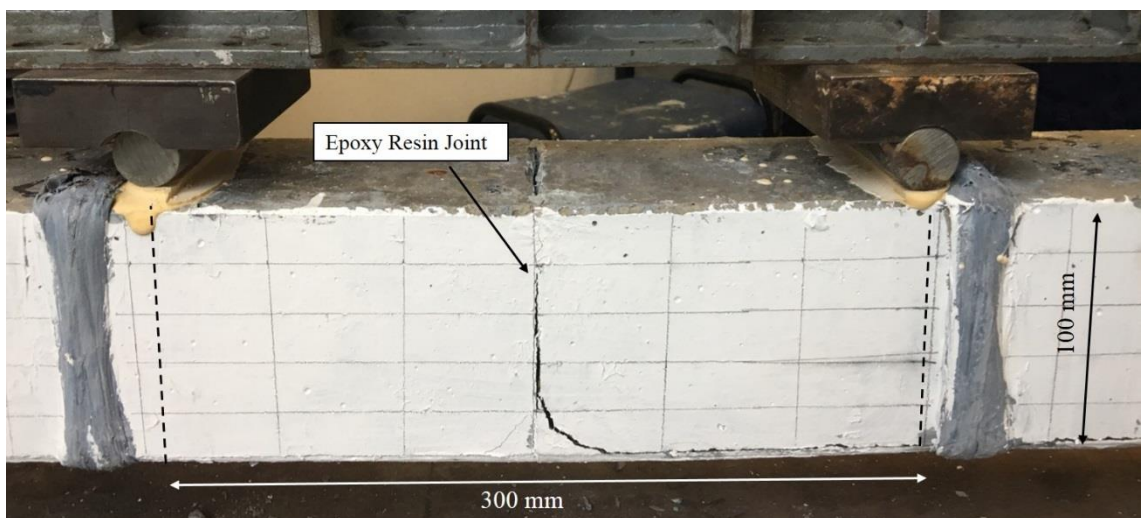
Crack and failure of the under-reinforced and air-exposed Beam CC2.1-A
